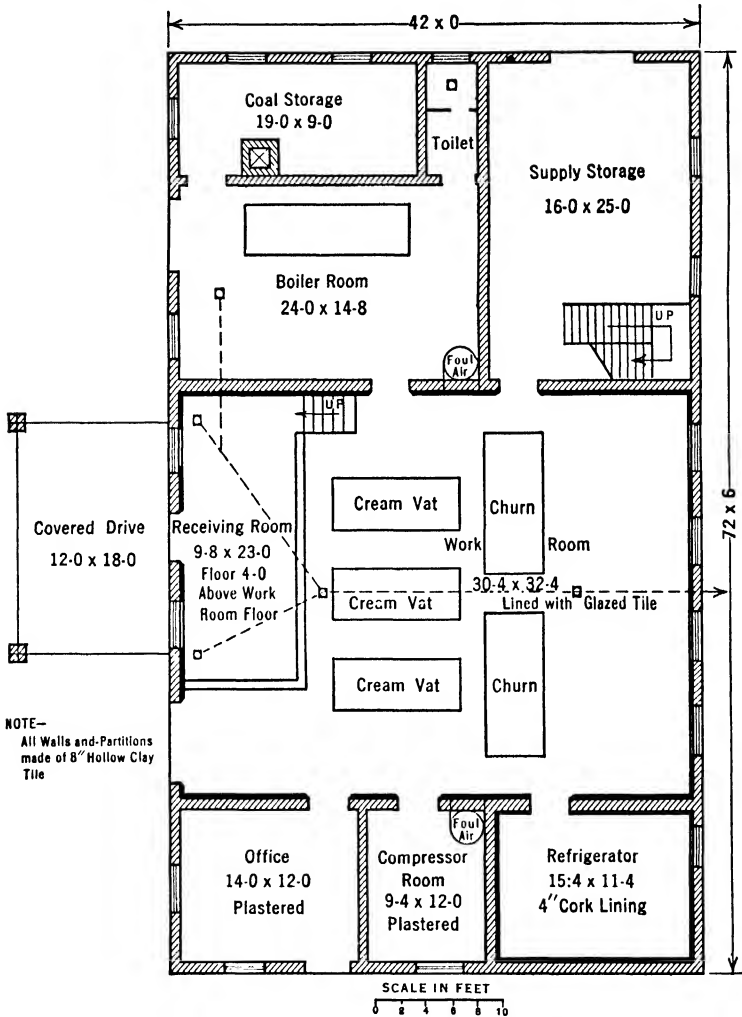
A good floor plan for a local creamery. Office and receiving room close. Sales room might replace compressor room. Greeley Creamery, Greeley, Iowa. From Iowa Bull. 267, 1930.
